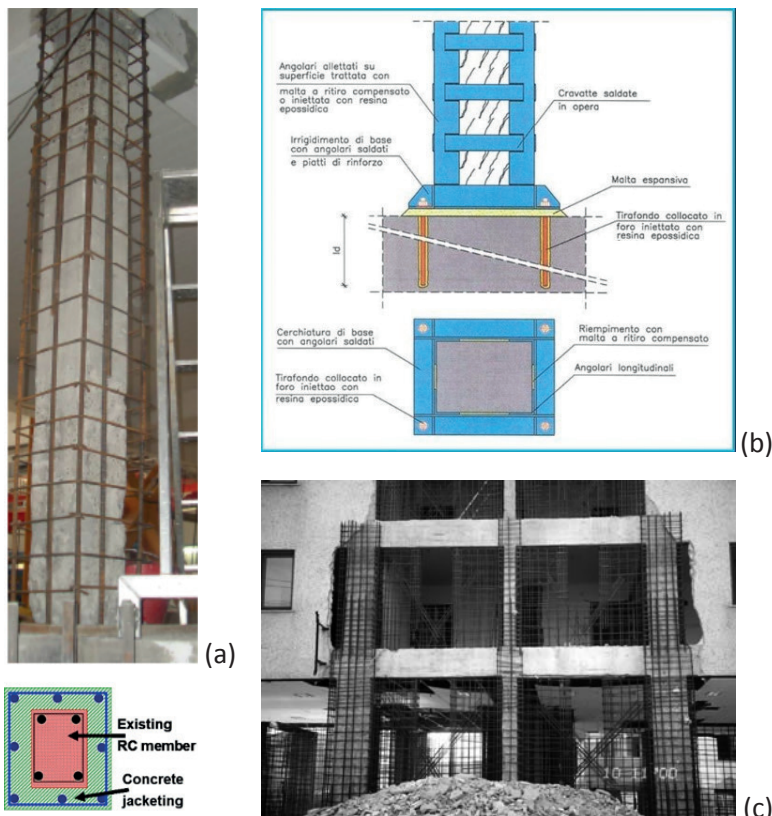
Strengthening techniques commonly used for RC buildings: a) concrete jacketing, b) steel jacketing, c) insertion of RC shear walls.
